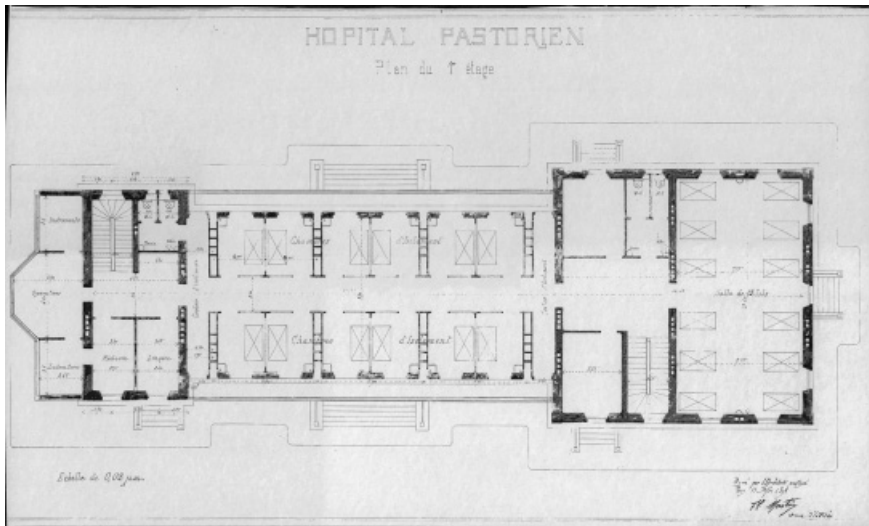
The hospital, 1st floor plan, Archives de Paris.
